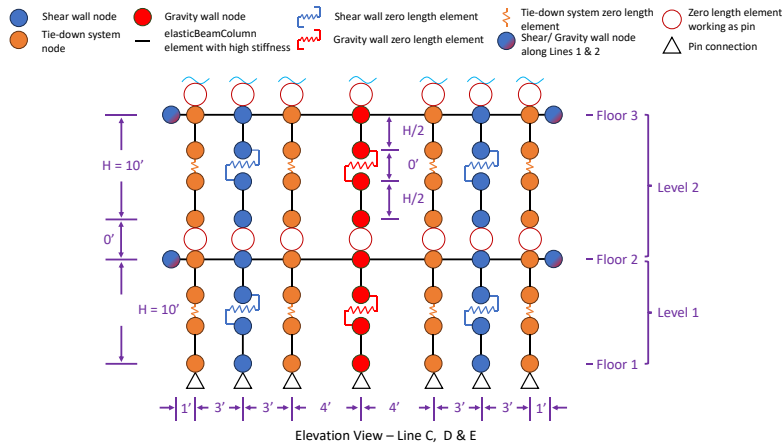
Schematic elevation view of wall lines C, D & E of model 1
